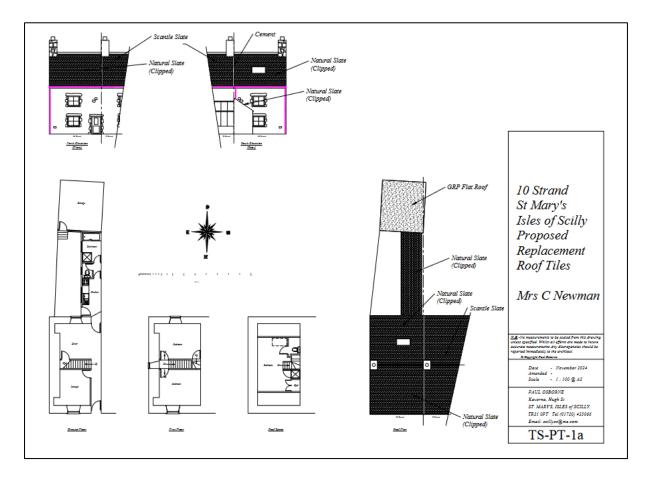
Plans of No.10 The Strand and proposed areas of replacement slate. (TS-PT-1a).
